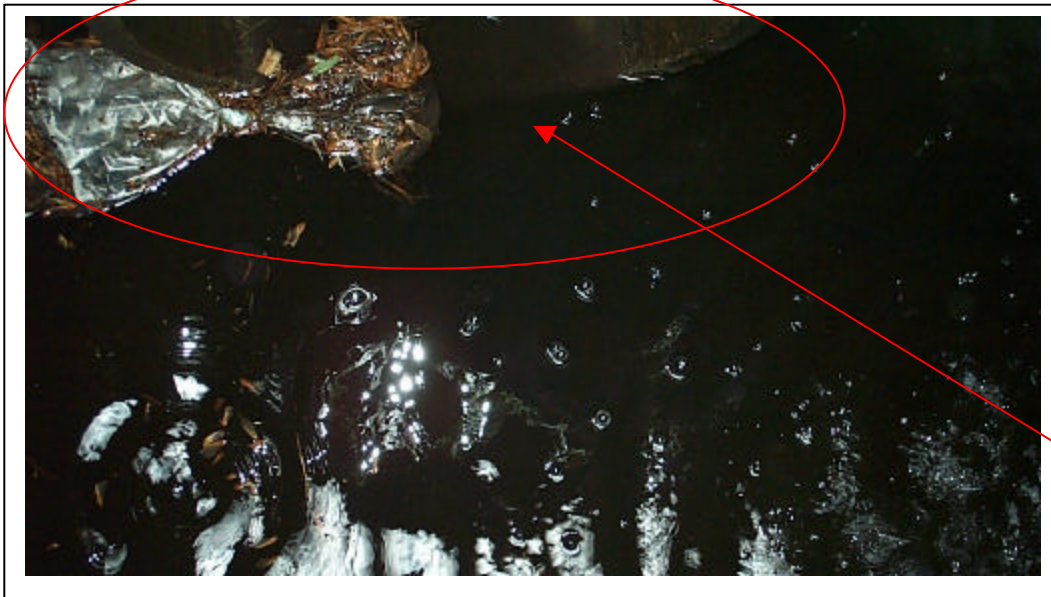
Dog bag entering top of outfall (looking down into catch basin).
